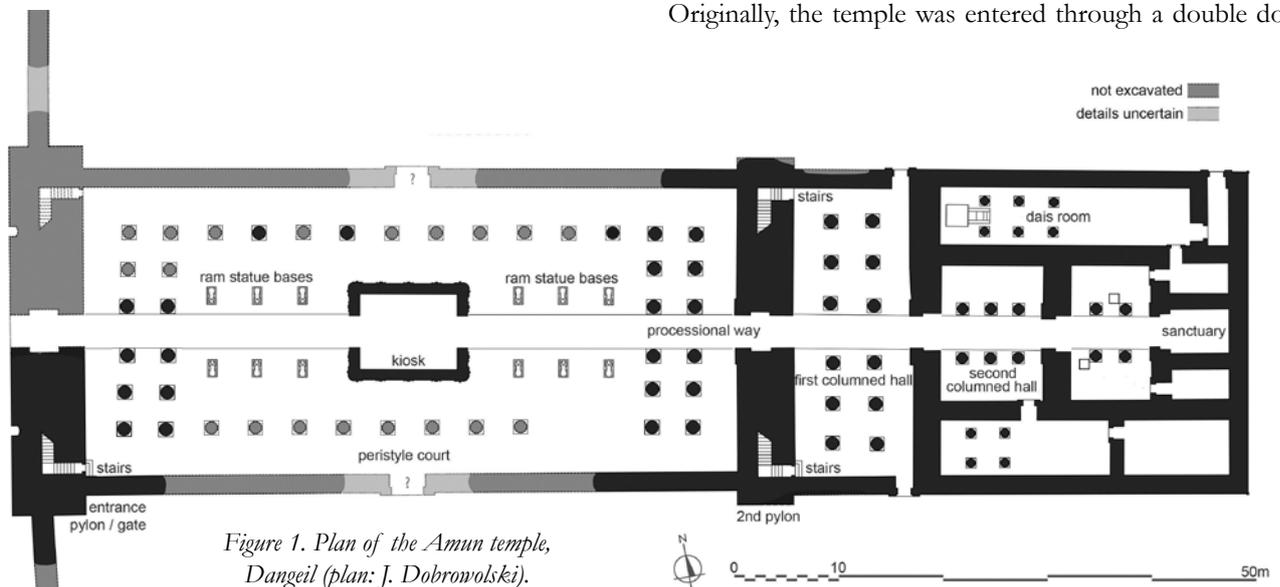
Plan of the Amun temple, Dangeil (plan: J. Dobrowolski).
